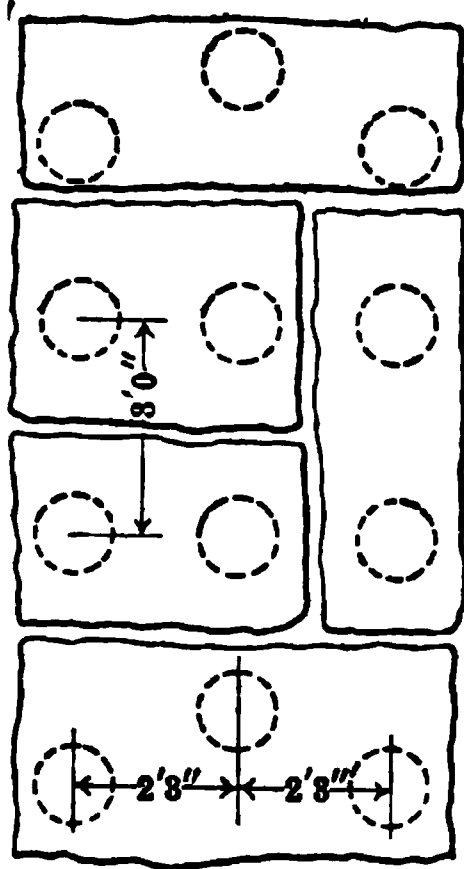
Stone Capping for Three Rows of Wooden Piles
